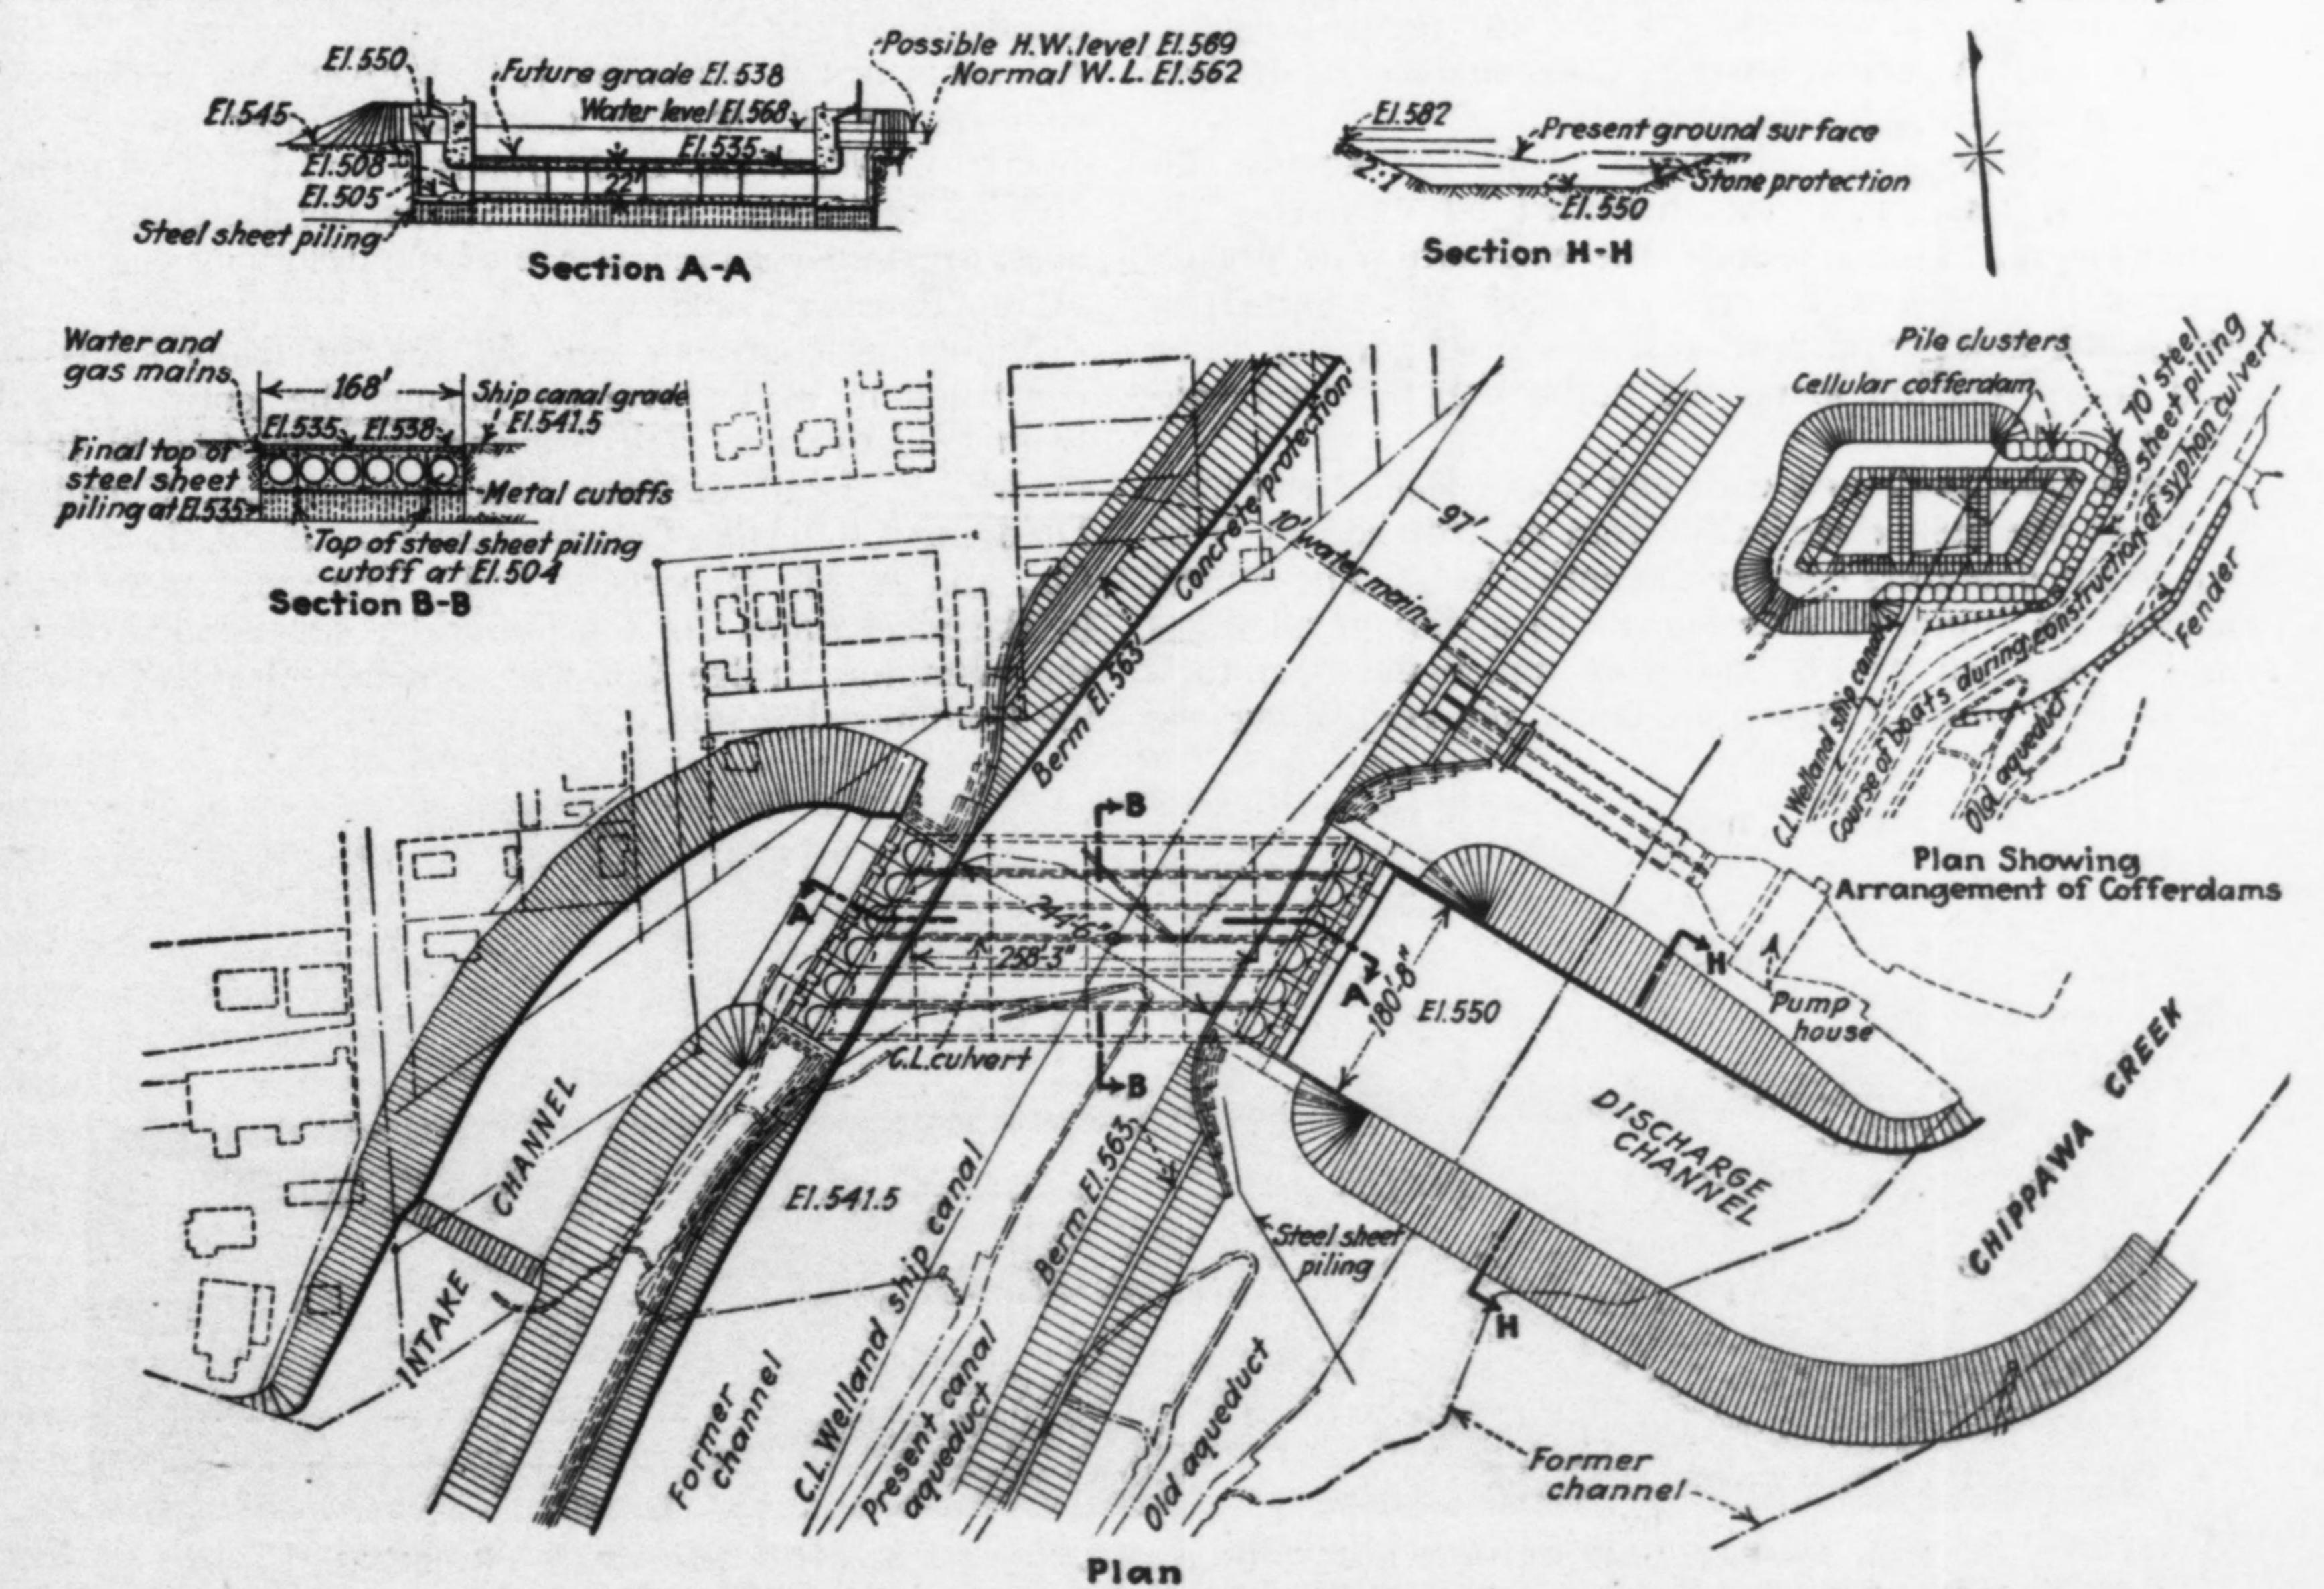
SIPHON CULVERT FOR CHIPPAWA CREEK
